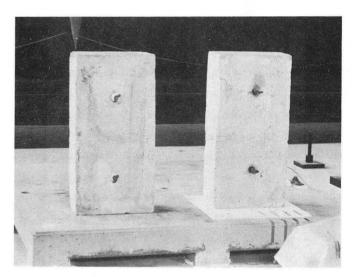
Effect of friction on response mode. (Left block, concrete on concrete, rocked and was damaged. Right block, teflon on teflon, slid with no damage.)
